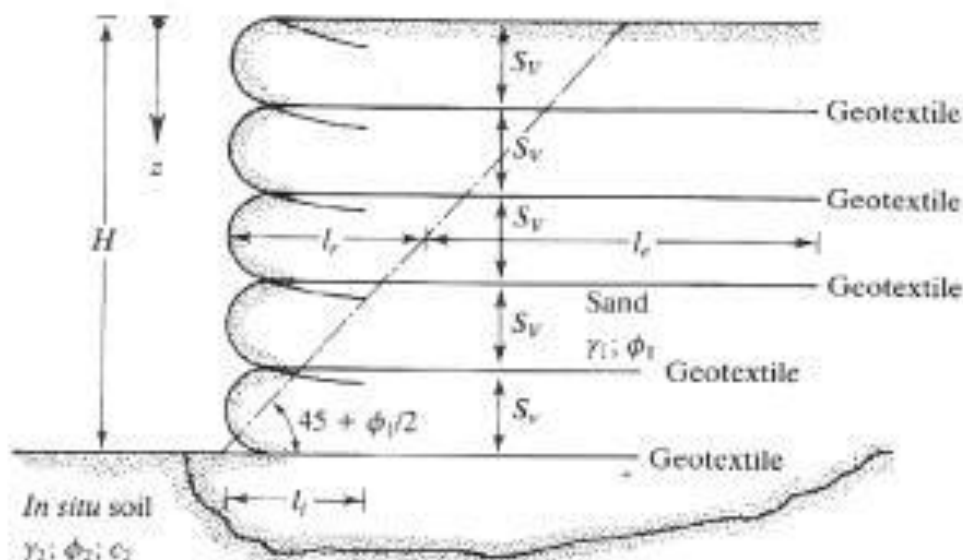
Revetment (Retaining Wall) With Geotextile Reinforcement
